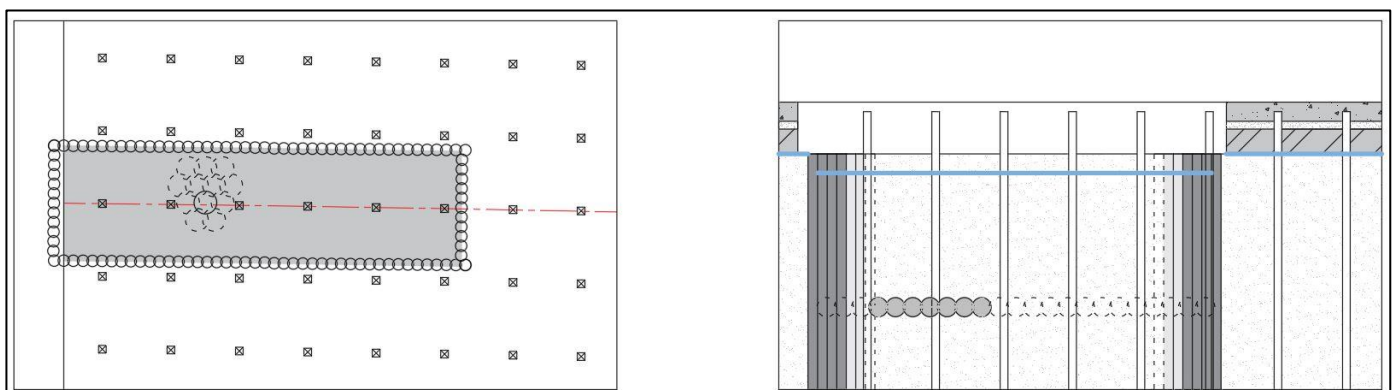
Second phase; removing the underwater concrete floor and achieve a watertight building pit.
